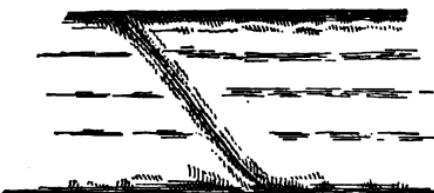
AN IMPROPERLY CONSTRUCTED BAR.
